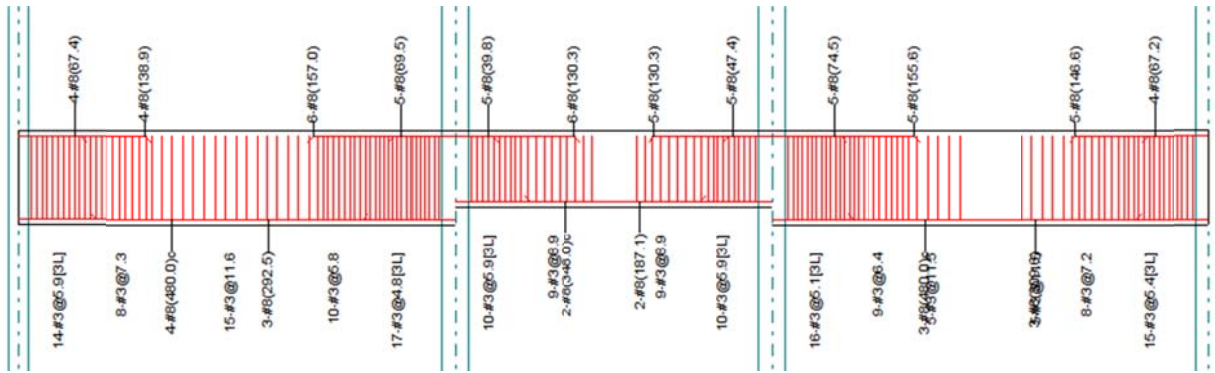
spBeam Column Line F Reinforcing Diagram (Lateral Loads)
